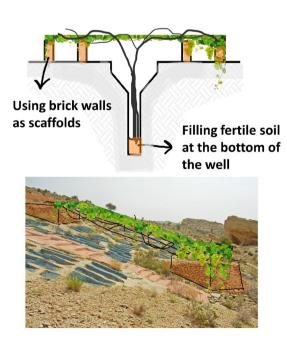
Details of the well garden and brick walls (Design: Marziyeh Tahmasbi).
